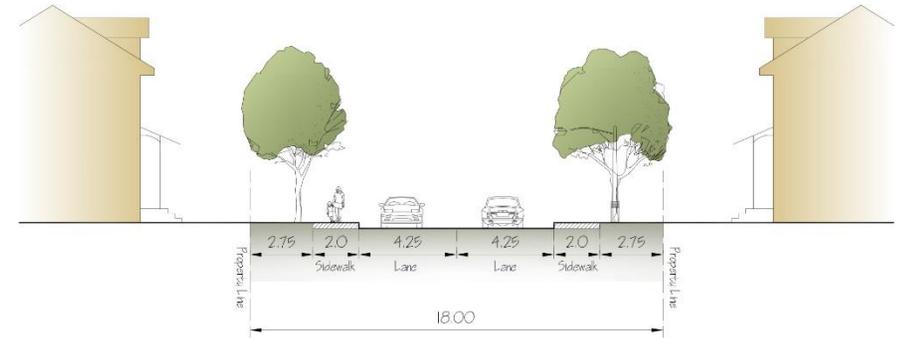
Local Street with Double Sidewalk Cross Section (18.0m)
